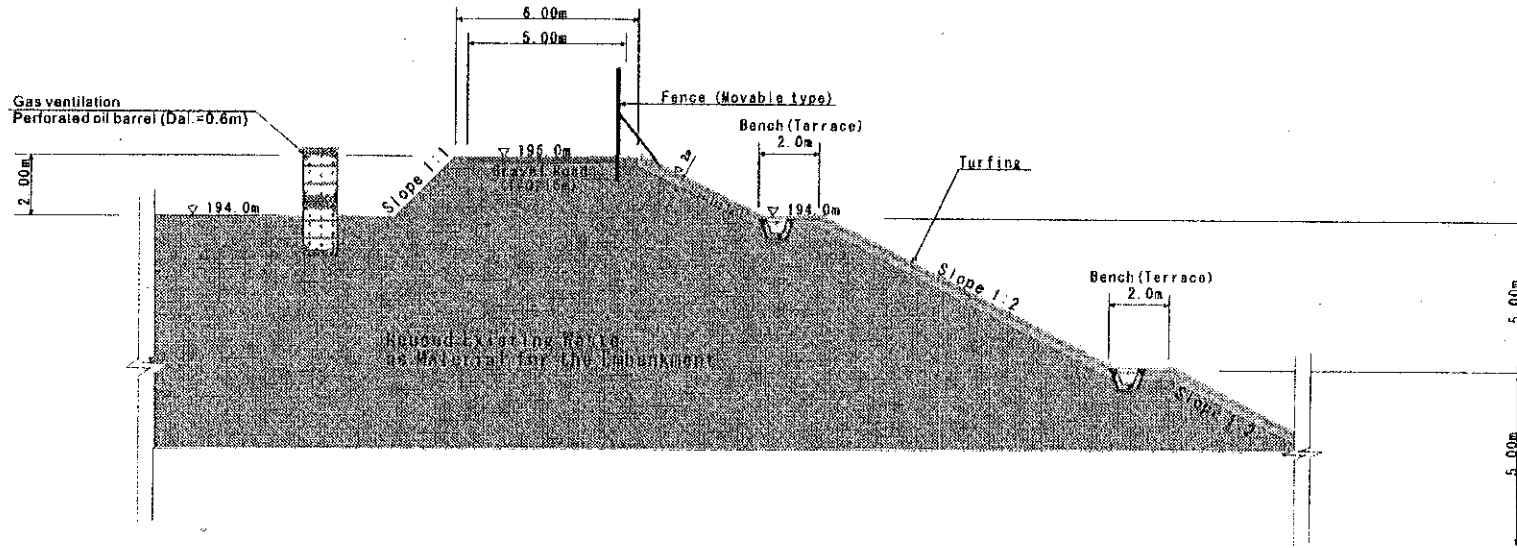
Layout of Improved Gohagoda Landfill Site
